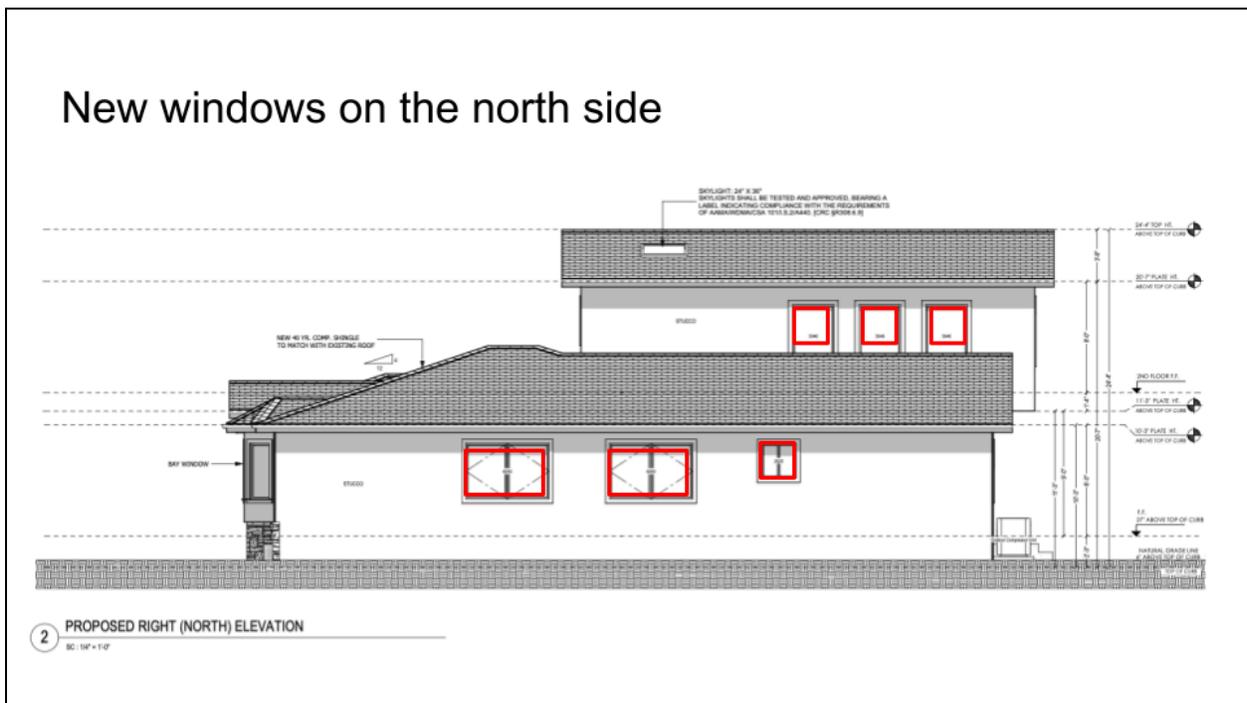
Planned 6 windows of 1585 Mallard Way facing our property
